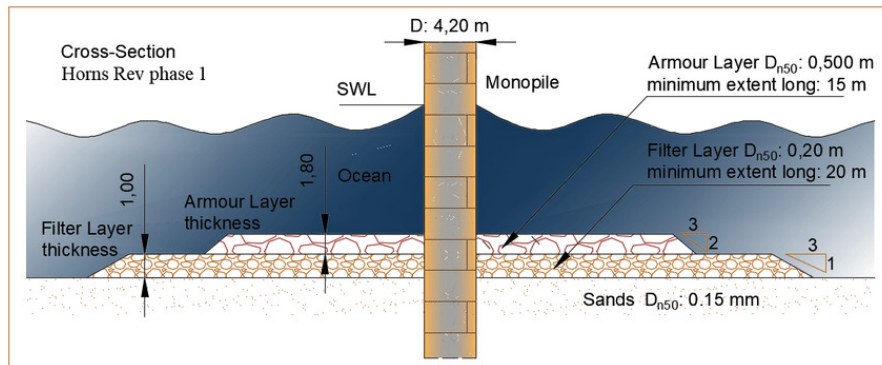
Horns Rev 1 foundation and scour protection [32]
